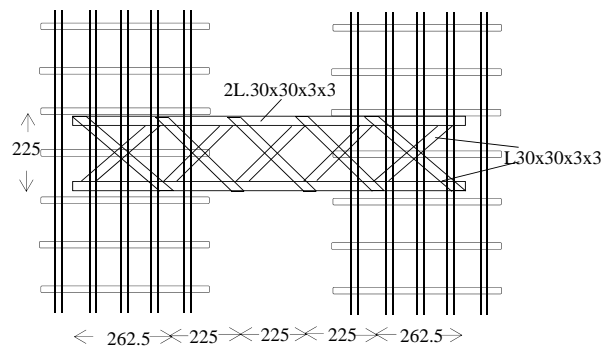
The configuration of steel truss coupling beam with shear wall (The dimensions are expressed in mm)
